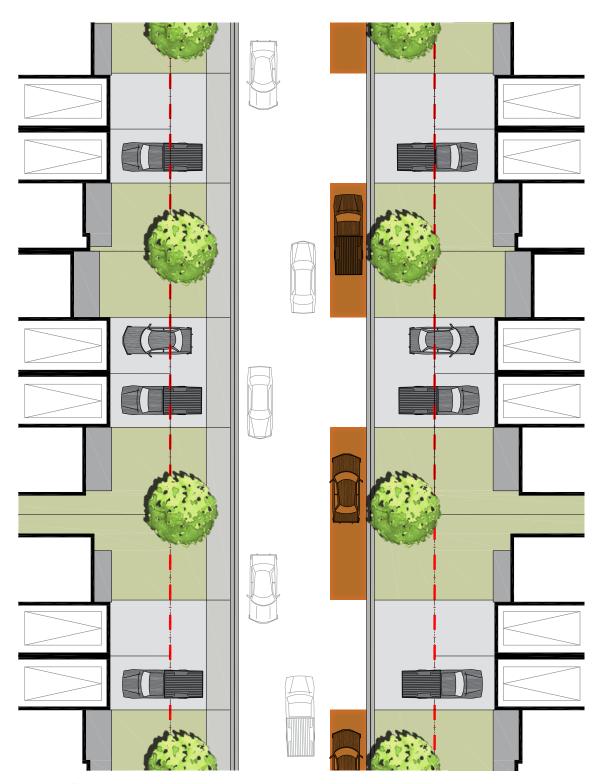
Front-Drive Townhomes Parking Demonstration on Local Road
